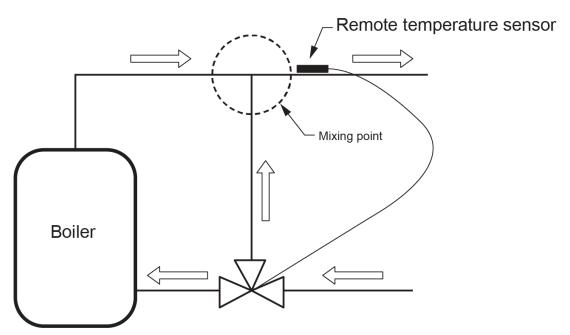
Diverting valve piping arrangement. (Greg Wirachowsky/Skilled Trades BC, 2021) Used with permission.
